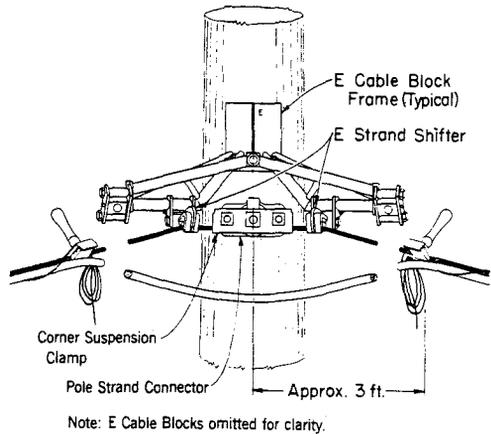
E Strand Shifter installed on Typical E Cable Block Frame
